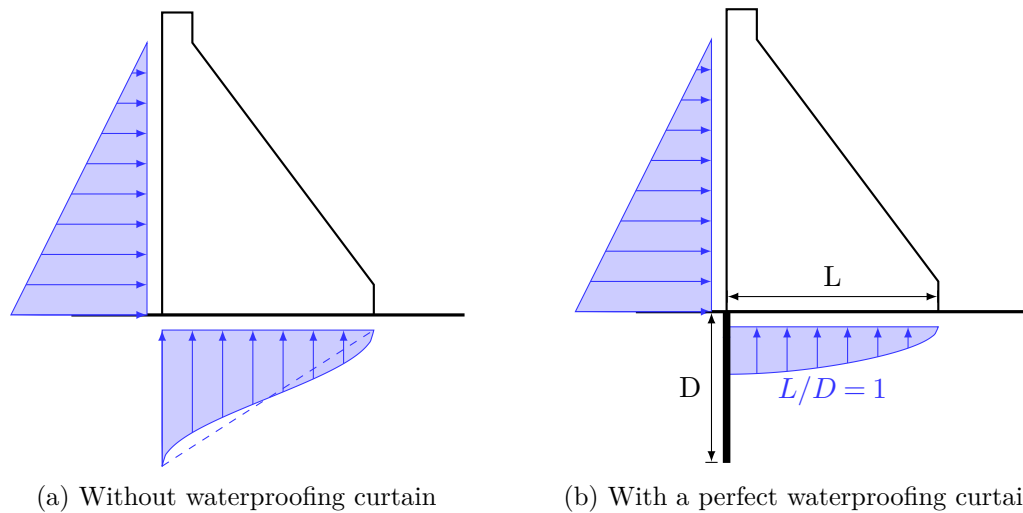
Hydraulic potential at the base of an impermeable dam founded on a porous foundation (Weaver 1932).
